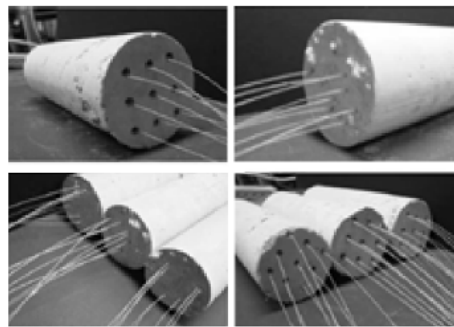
Concrete elements with embedded arrays of optical fibres that serve as binary-type indicators of structural damage (cracks) in these elements.
